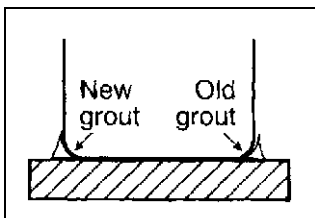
Flat bottom, rounded corners, grouted — good inside, poor outside
